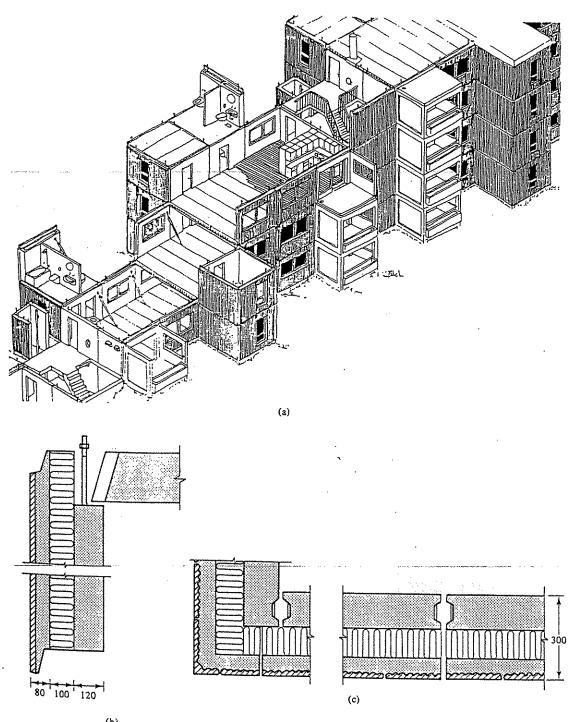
Hojgaard and Schultz system: (a) axonometric view, (b) vertical section through wall and joint, and (c) horizontal section through wall and joint.
